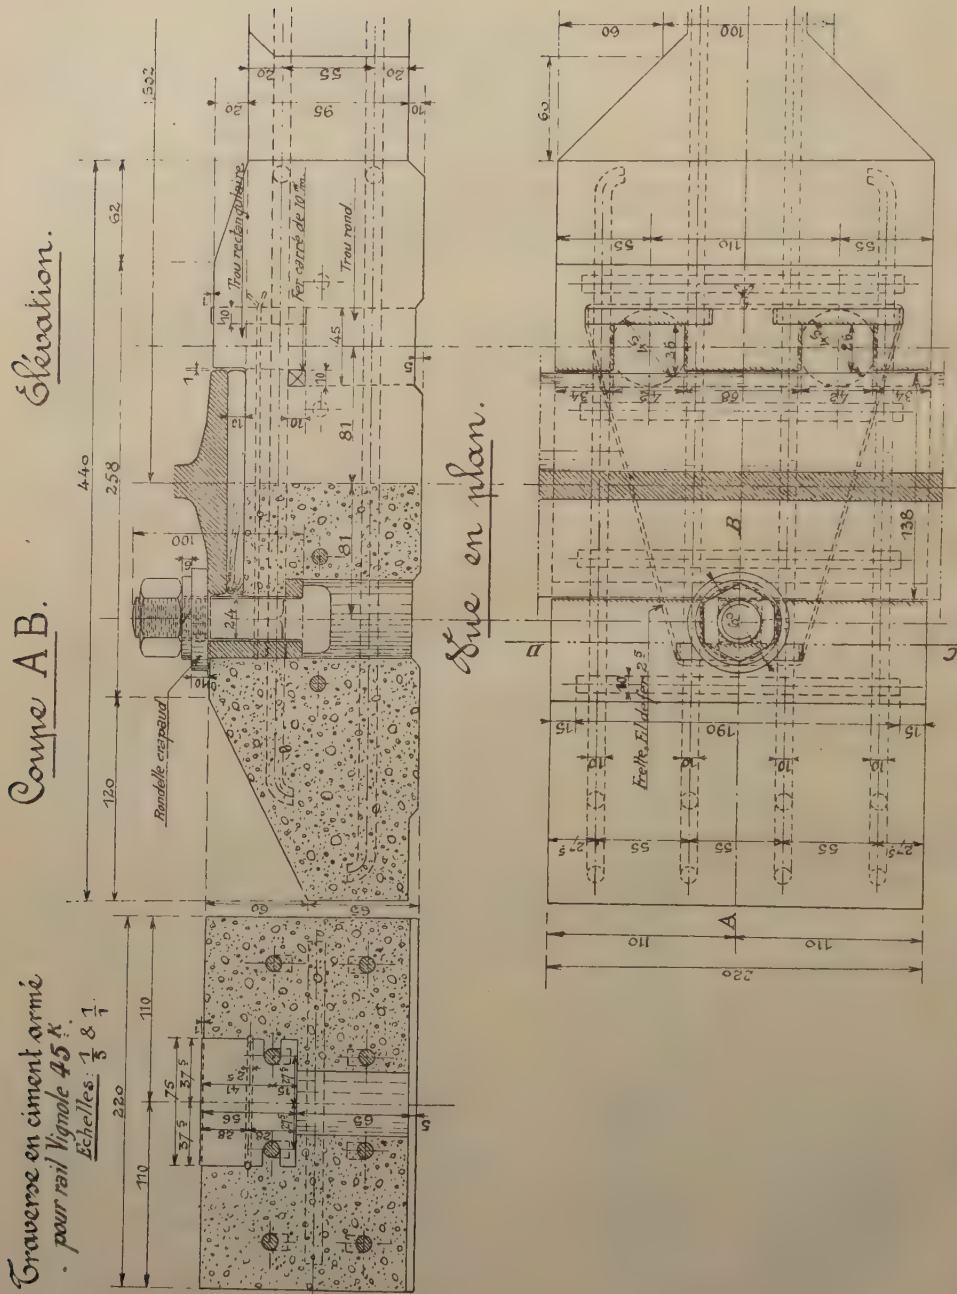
Ferro-concrete sleeper, T. C. R. P. type, with bolt and clip fastening. — Detail of fastening.
